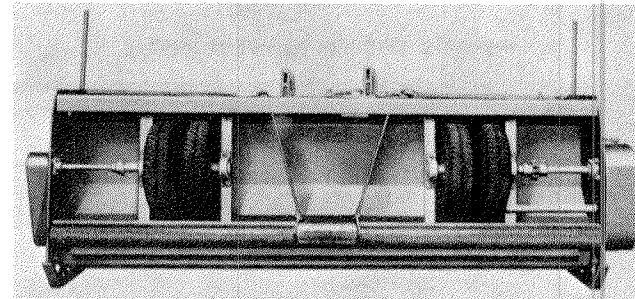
Bottom View of One Make of Mechanical Aggregate Spreader
